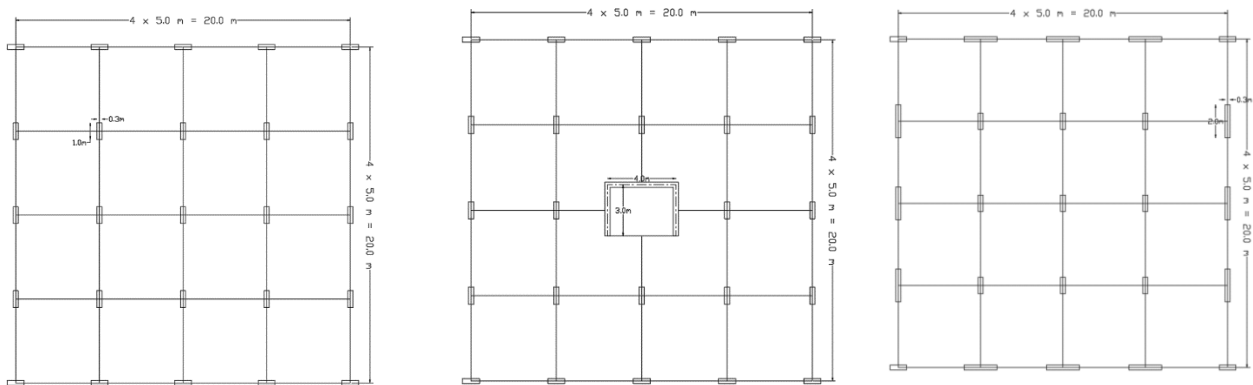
Superstructure typical floor layouts for 20 story building with the column, core system and shear wall system
